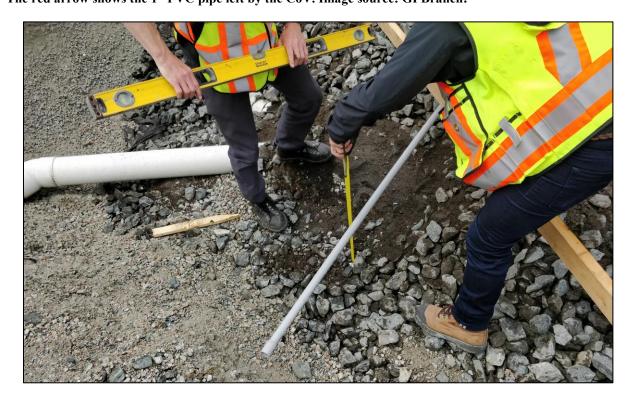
Assessment of the conditions for the soil sensor installation. The horizontal 1" PVC pipe in the picture was left by the CoV crews as a protection bridge to guard the soil sensors cables to the valve box.
